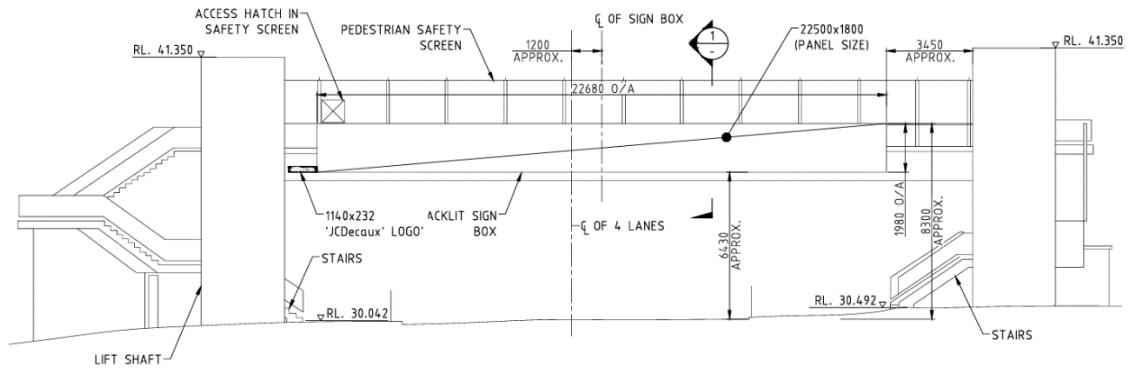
Sign elevation - east (Source: Dennis Bunt Consulting Engineers)
